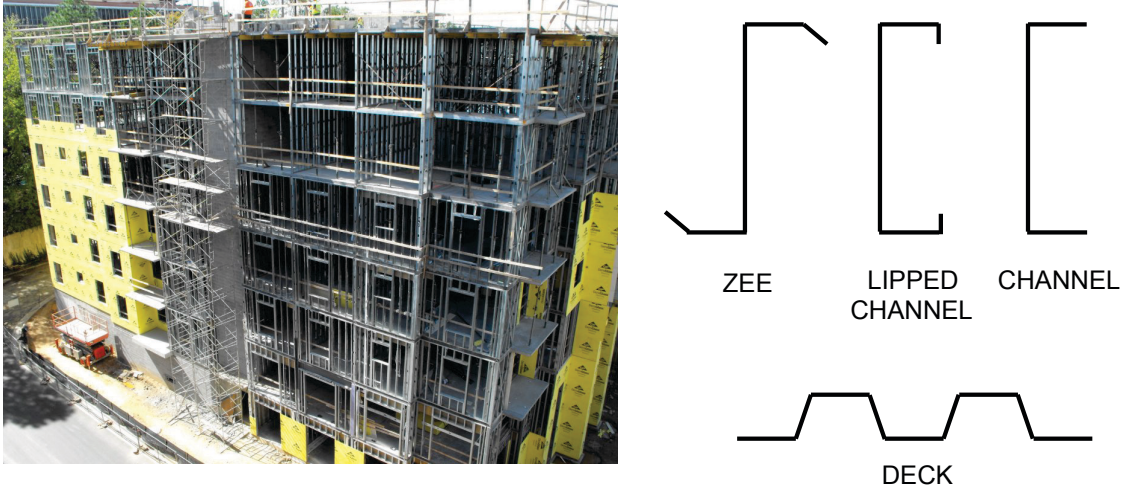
At left, photograph of stick-style construction for a cold-formed steel-framed hotel in Buckhead, Georgia (photo credit: Don Allen, DSi Engineering). At right, drawing of common CFS cross-sections, highlighting the two most used: zee and lipped channel (Peterman 2014)
